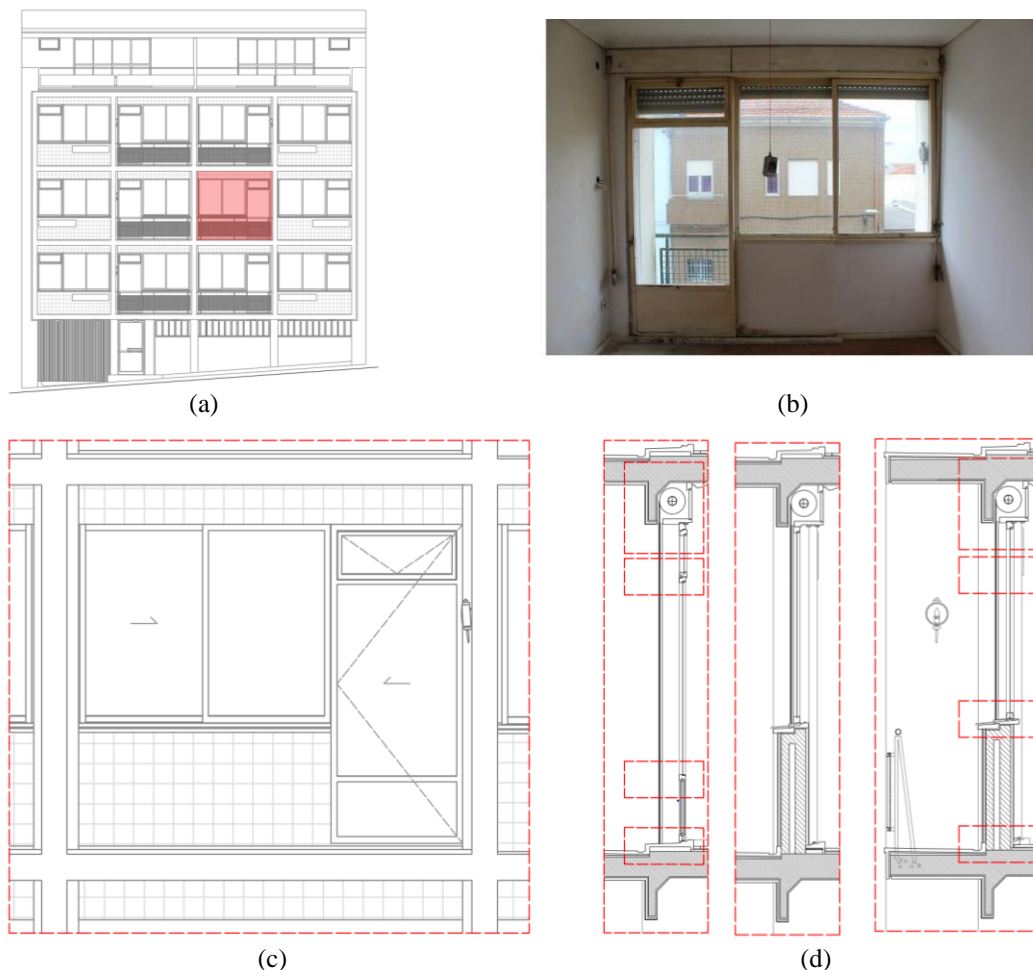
Constructive details of the living room: (a) South façade (b) Photo of the interior of the living room (c) Living Room facade 1:50 (d) Vertical Sections 1:50.
